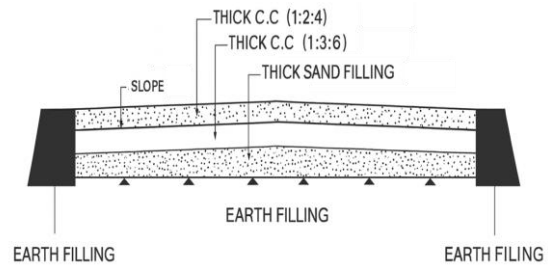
Cross-section of a cement concrete (CC) road constructed in hard soil conditions
